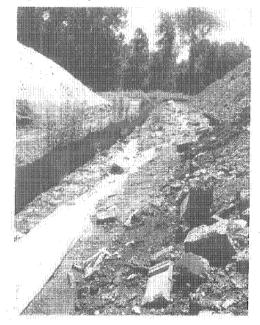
Complete D9 Area (West) – Completed D9 Excavation. Note PIM slope material from 20' – 25' BG5 layer staged in the excavation as backfill (8/20/2010).
